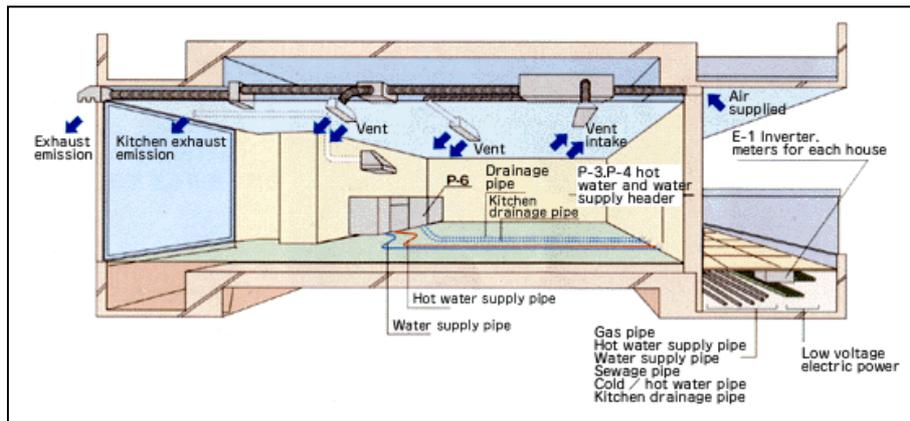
Support system providing flexibility of infill (Next 21, 2001).
